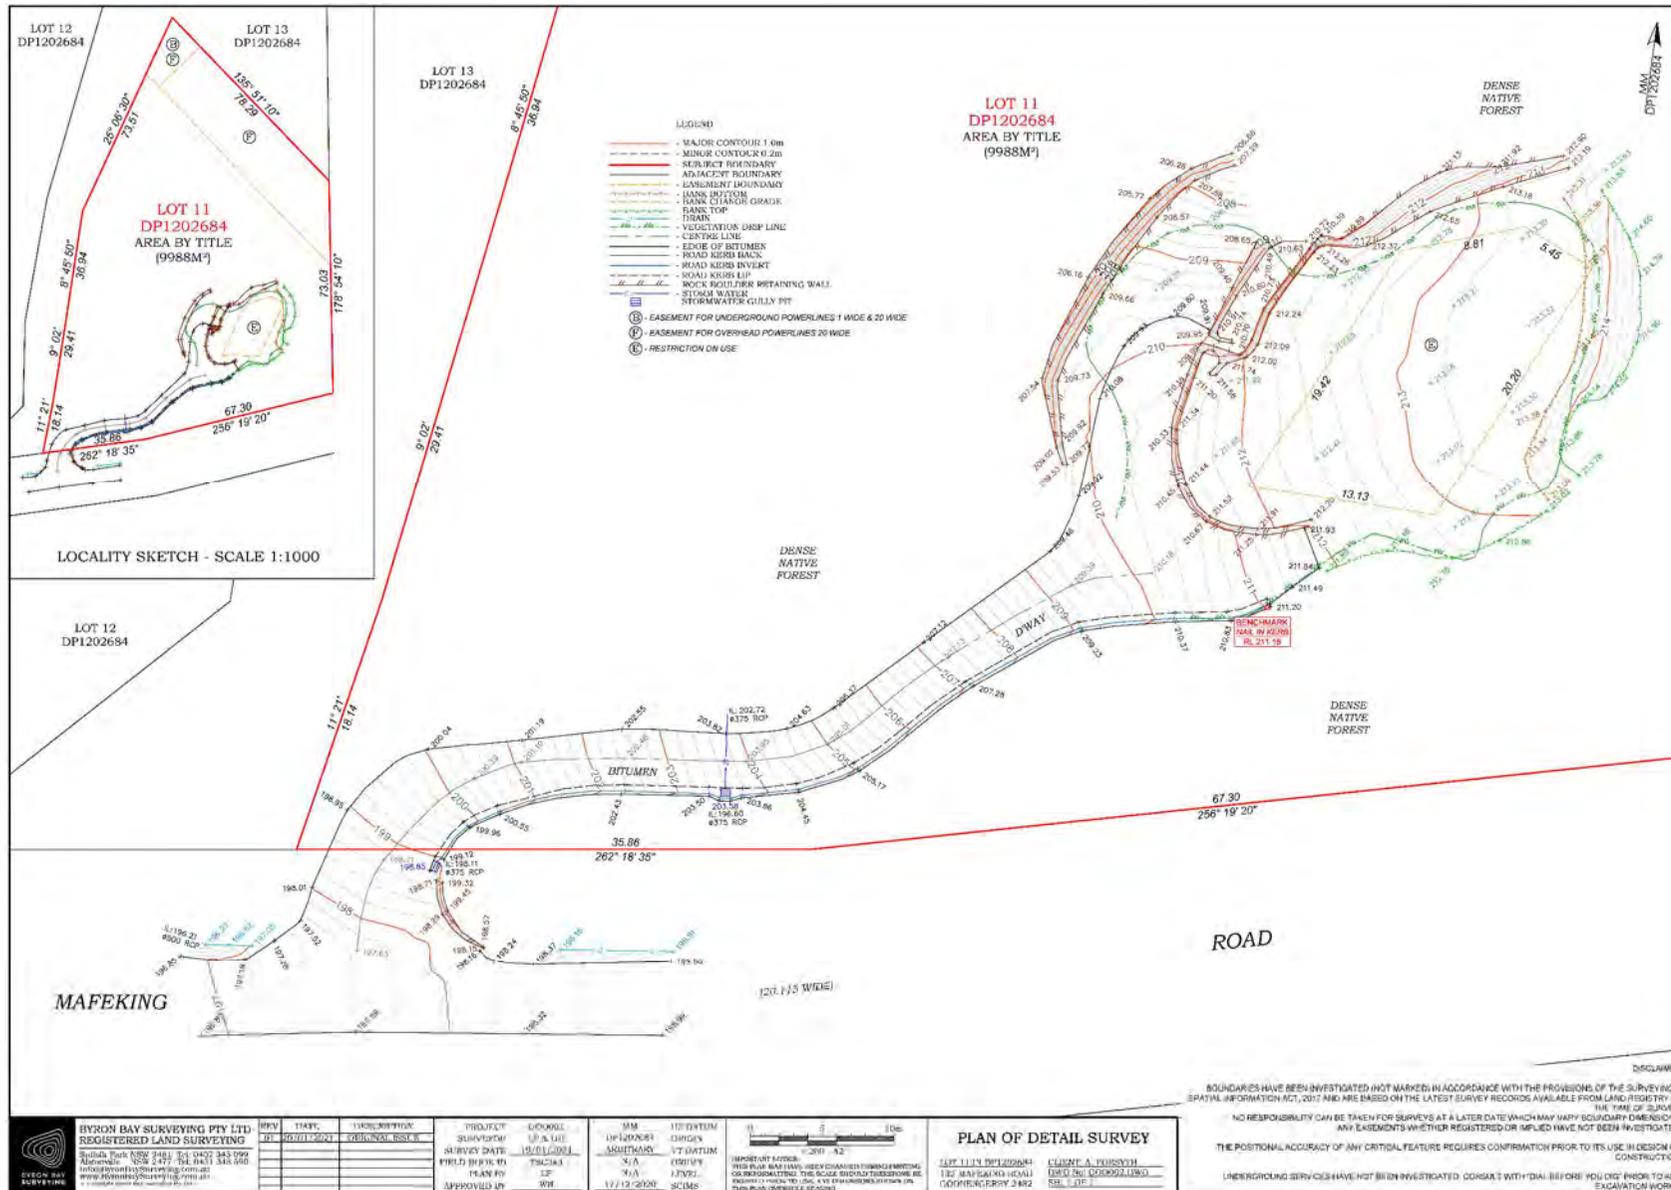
Current site survey identifying the bitumen driveway, retaining walls, building envelope and vegetation drip line
